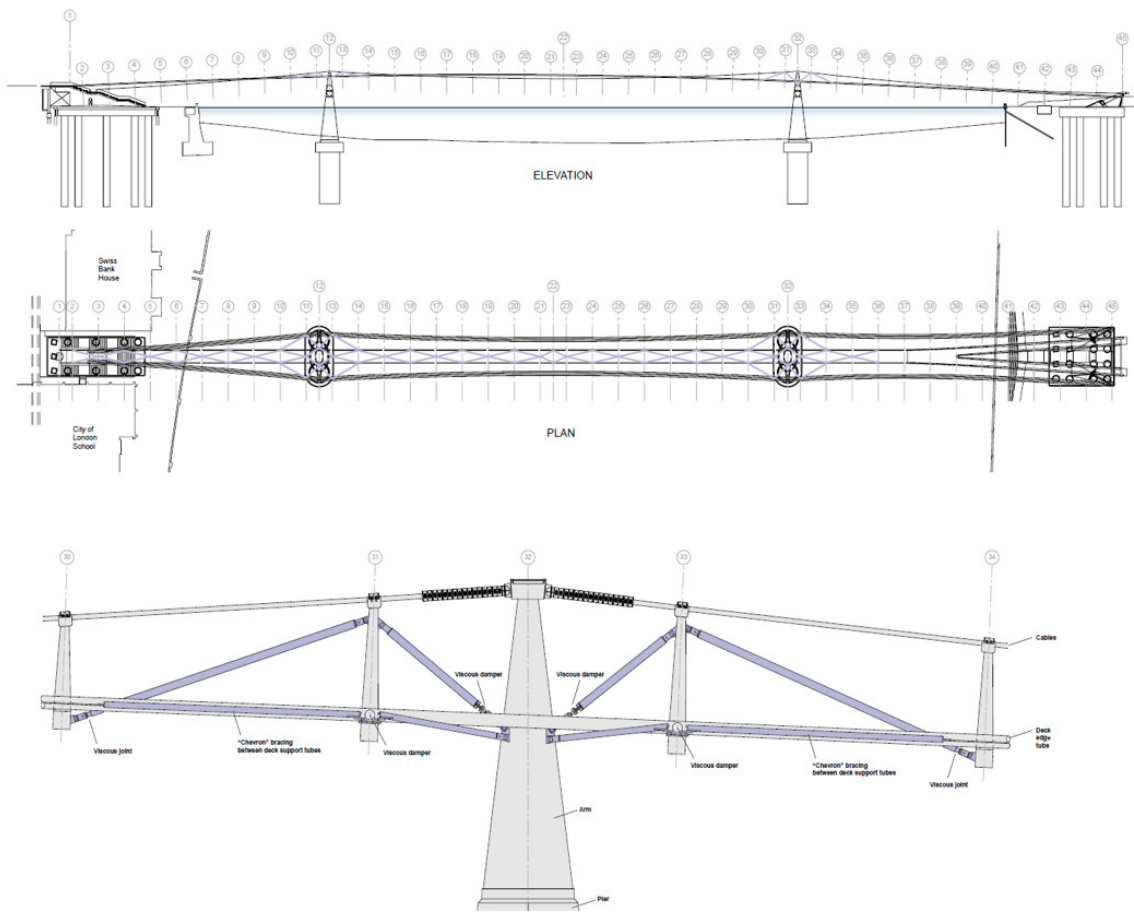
Arrangement of dampers in plan and elevation of the bridge (Dallard, et al. 2001)
